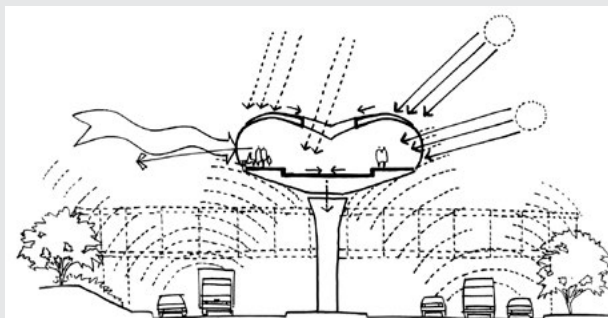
Illustration demonstrating natural ventilation impacts on Brentwood Station (Photo Credit: Perkins&Will)
